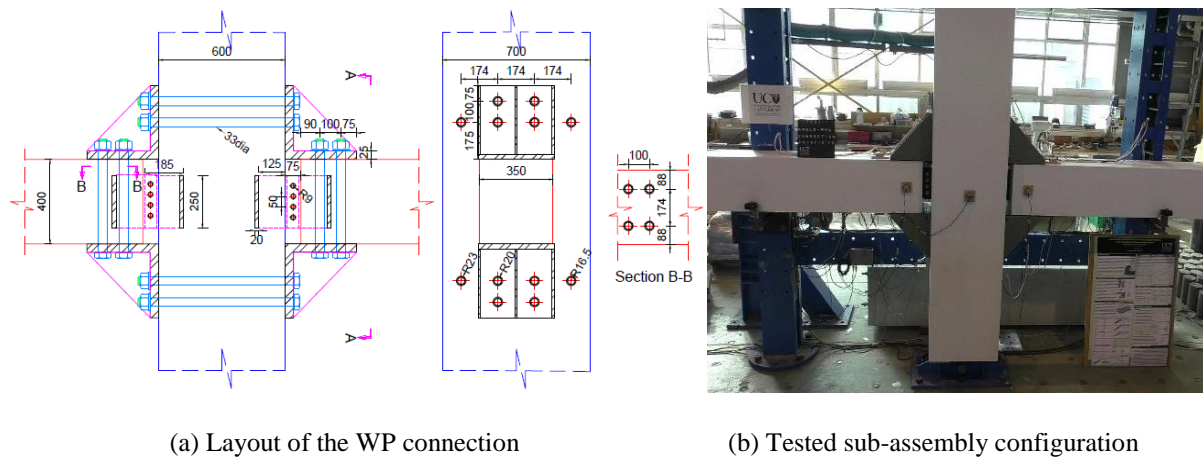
Layout of the AWP connection and tested sub-assembly configuration
